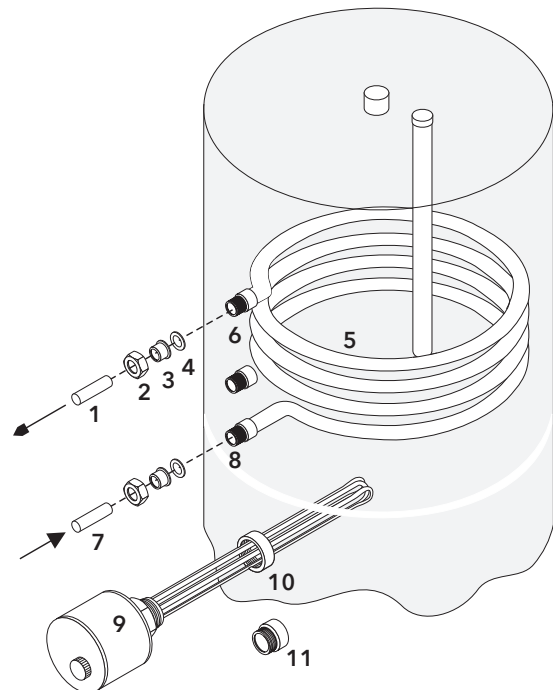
Connections for auxiliary heating devices. (1) flow pipe, (2, 3, 4) fittings, (6) auxiliary heating coil, top connection, (7) return pipe, (8) auxiliary heating coil, bottom connection, (9) immersion heater, (10) 1½" inlet, (11) plug
